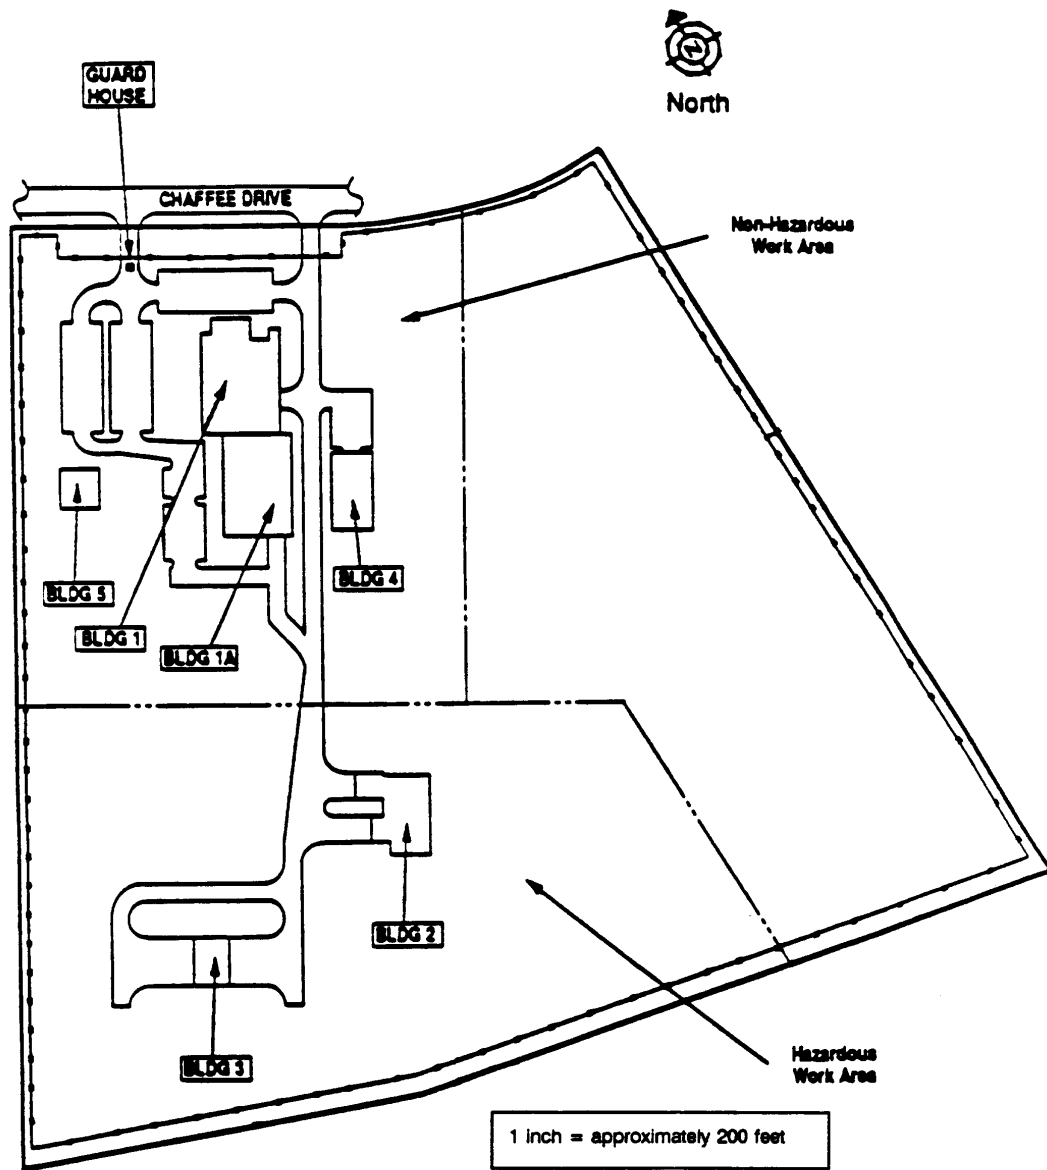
LAYOUT OF BUILDINGS AT SITE
